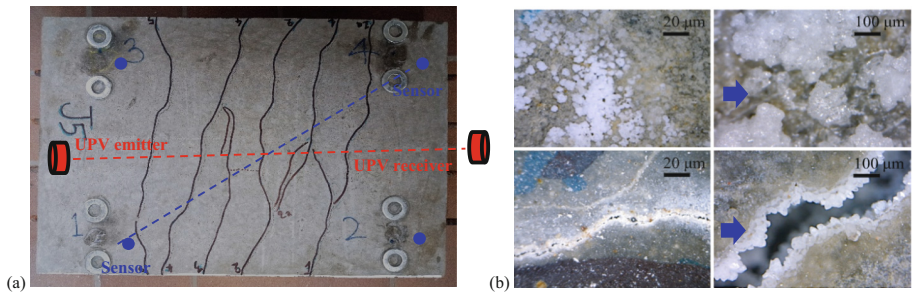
a) Bottom view of the concrete slab with the inter-connected cracks marked in black color; b) Microscopic inspection of salt depositions at the concrete surface and through the crack.
